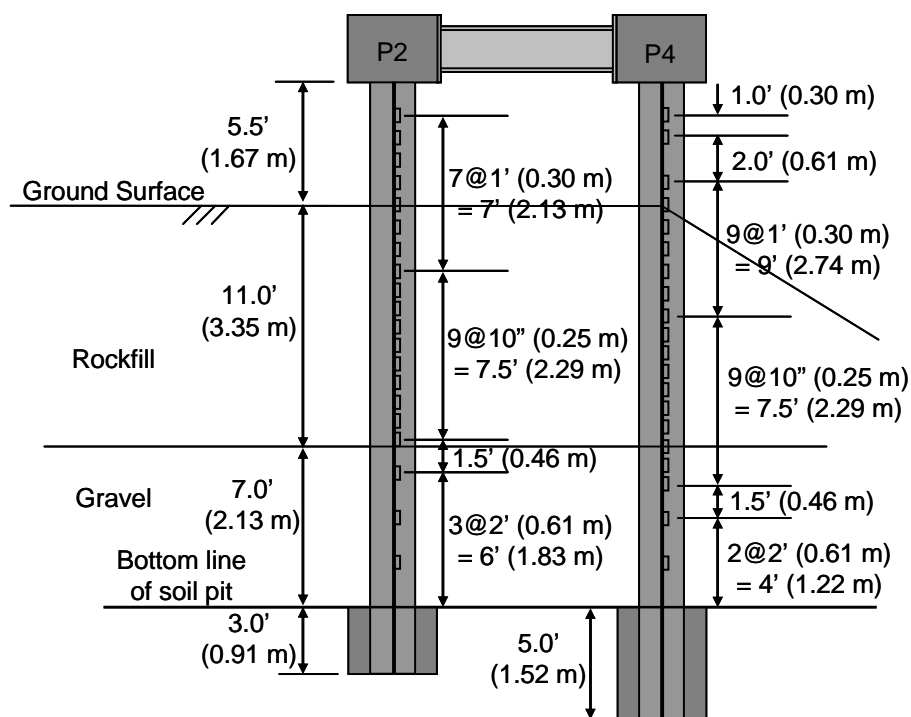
Elevations of strain gages along test pile for System Test 2
